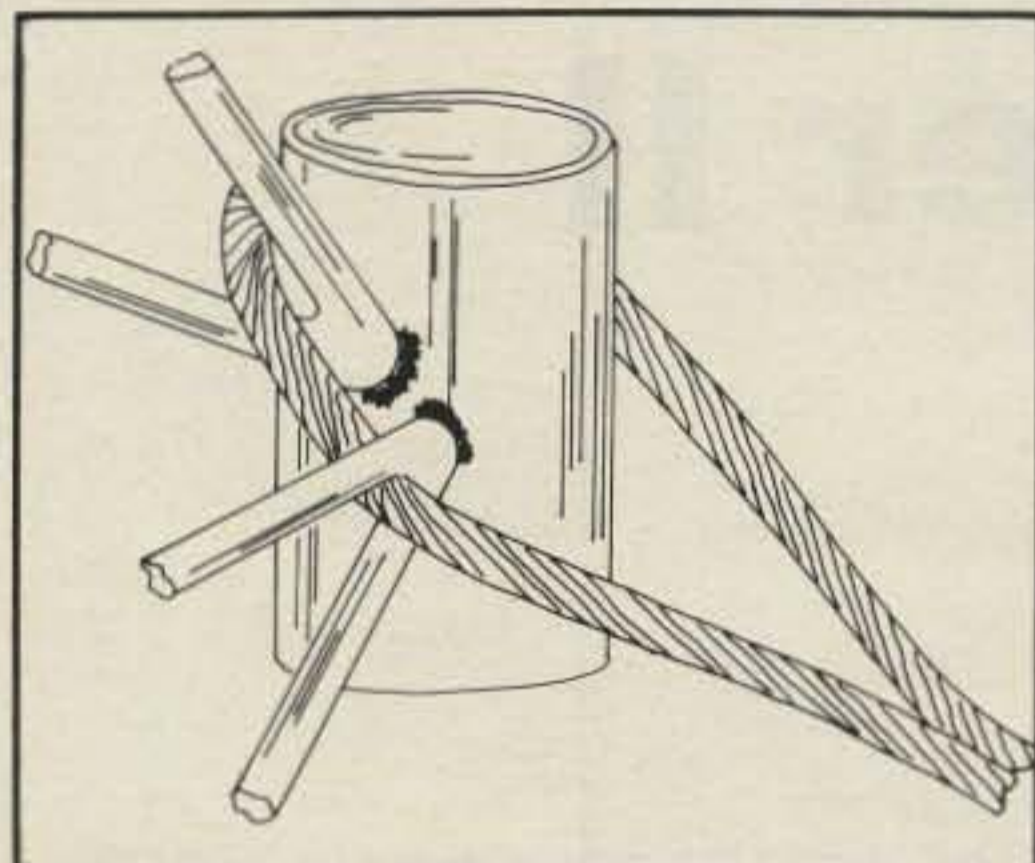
Guy wire tension should compress tower welds rather than place them in tension.
